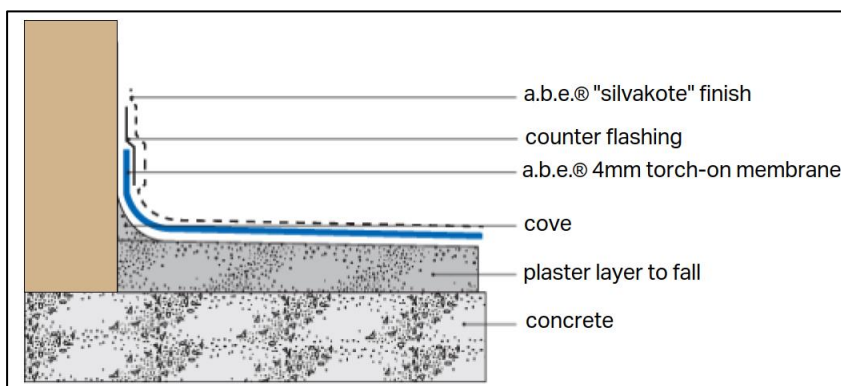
Typical detail showing waterproofing layering on top of concrete canopy and cable duct cappings
